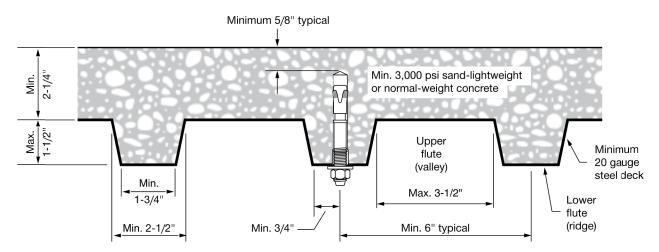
Installation of KWIK Bolt TZ in the soffit of concrete over metal deck floor and roof assemblies - B Deck
